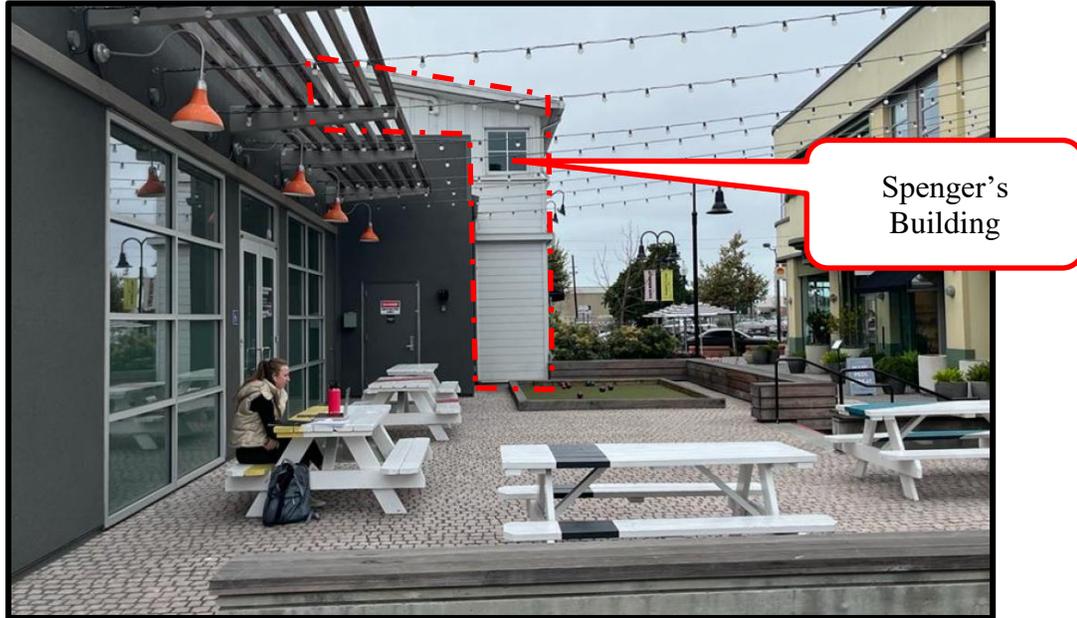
Overall Site Looking South– Existing Conditions at subject tenant space, Site Photo, Attachment 3
